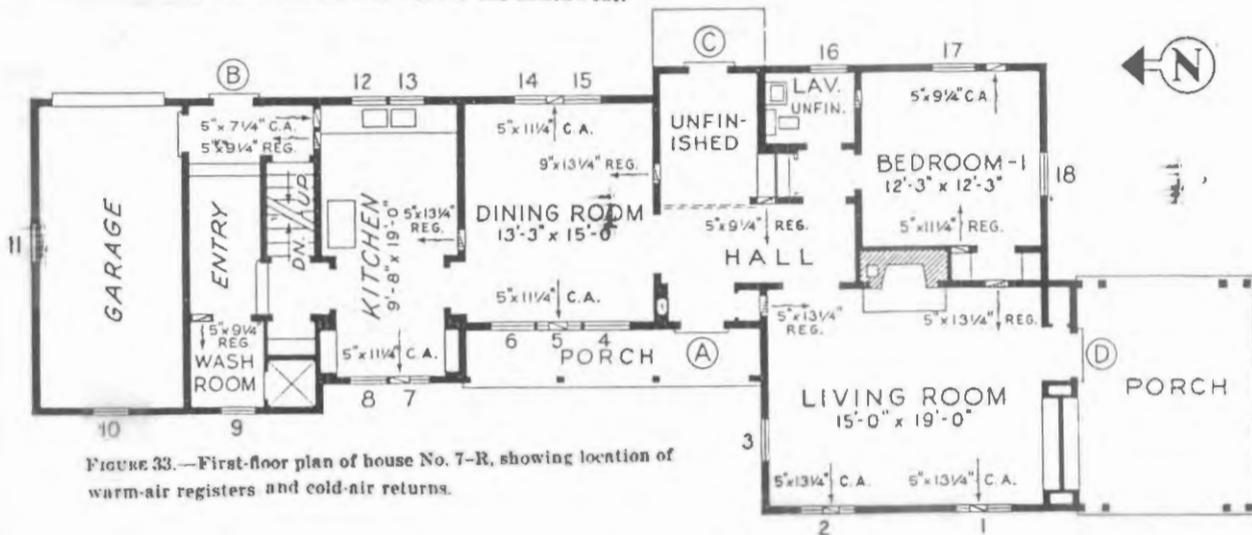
First-floor plan of house No. 7-R, showing location of warm-air registers and cold-air returns.
